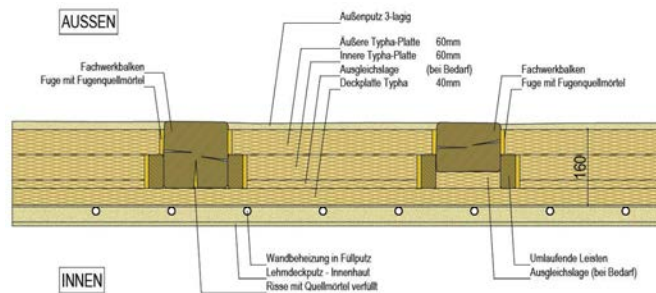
Layout wall structure planning guide, picture by Fritsch+Knodt&Klug.
